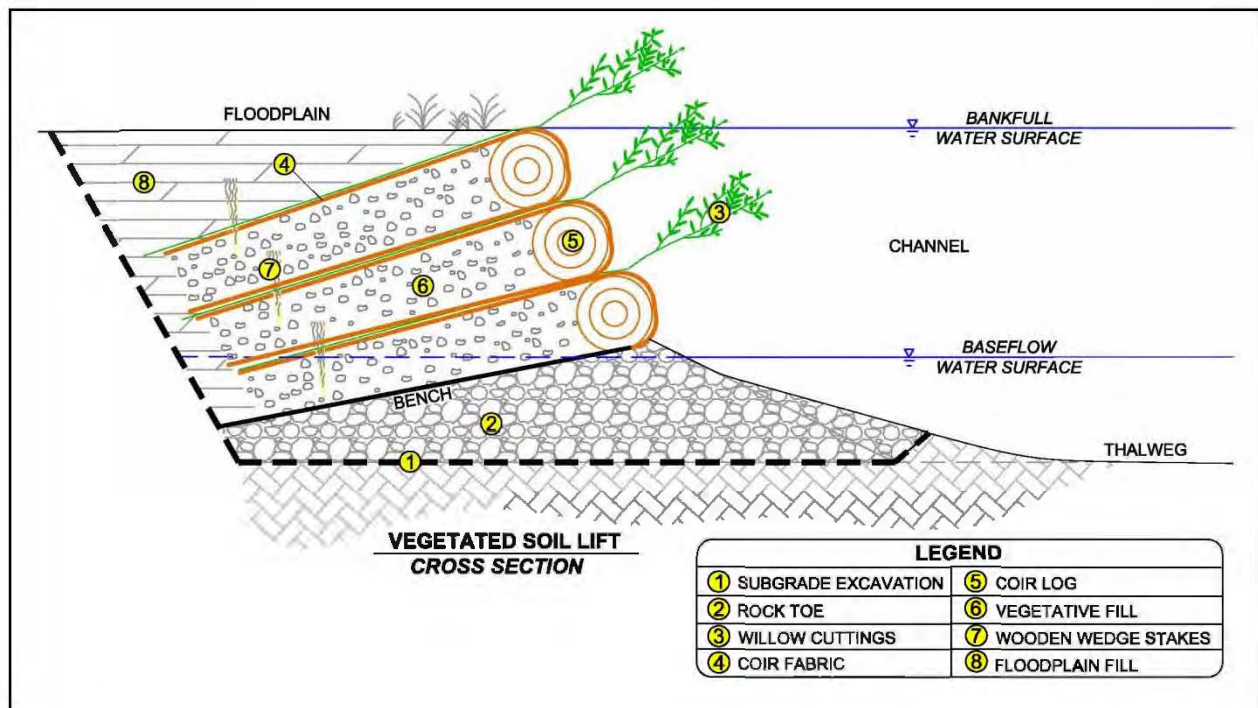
Conceptual cross section of a vegetated soil lift bioengineering streambank structure.
